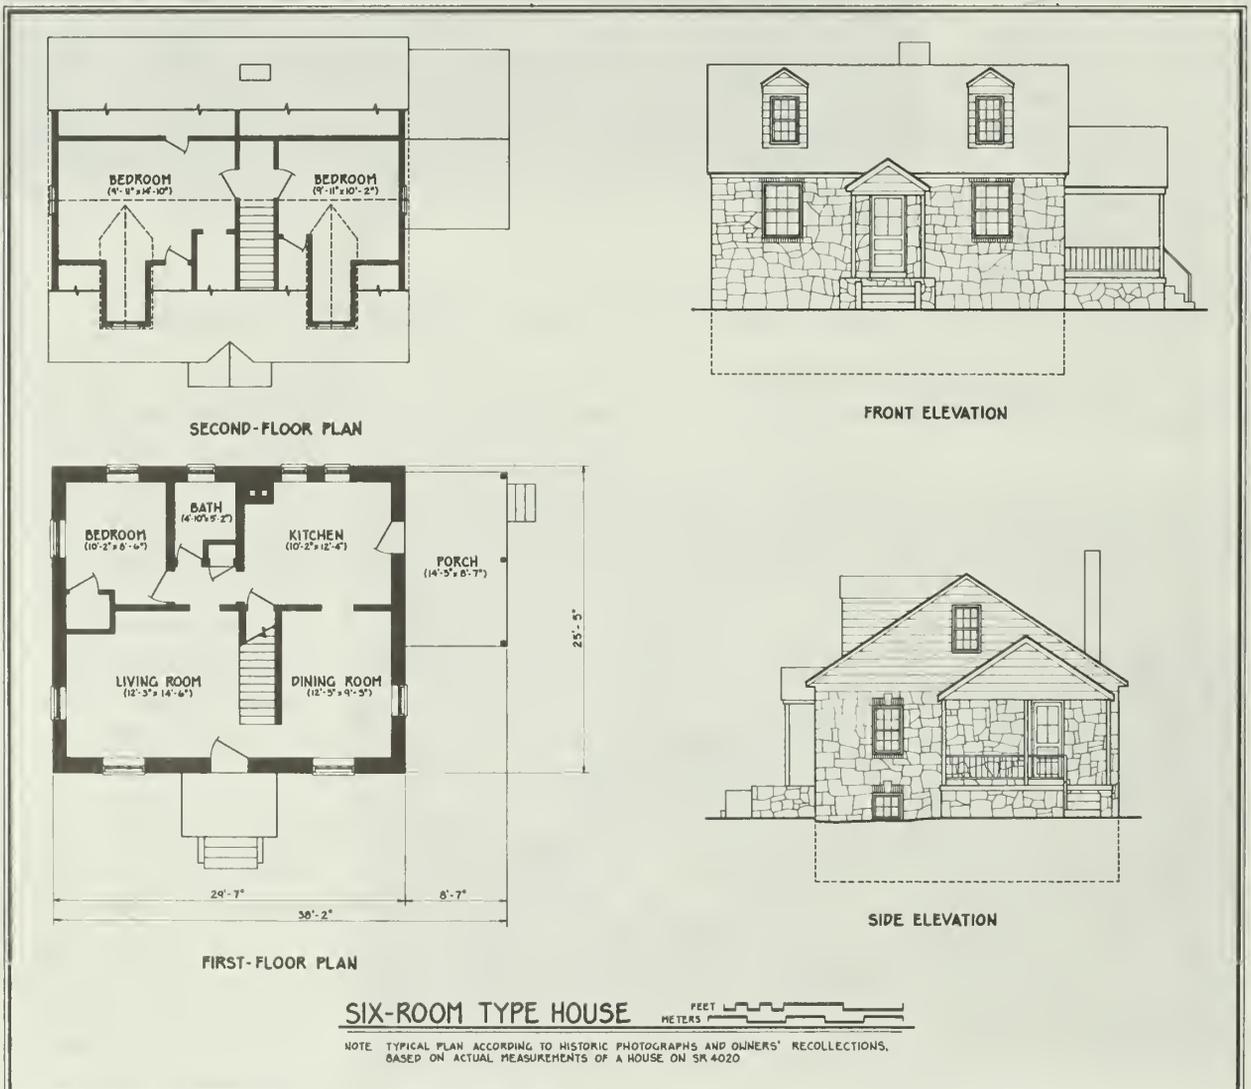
Plans and elevations of six-room, rectangular house. Delineator: Isabel C. Yang, HABS.
